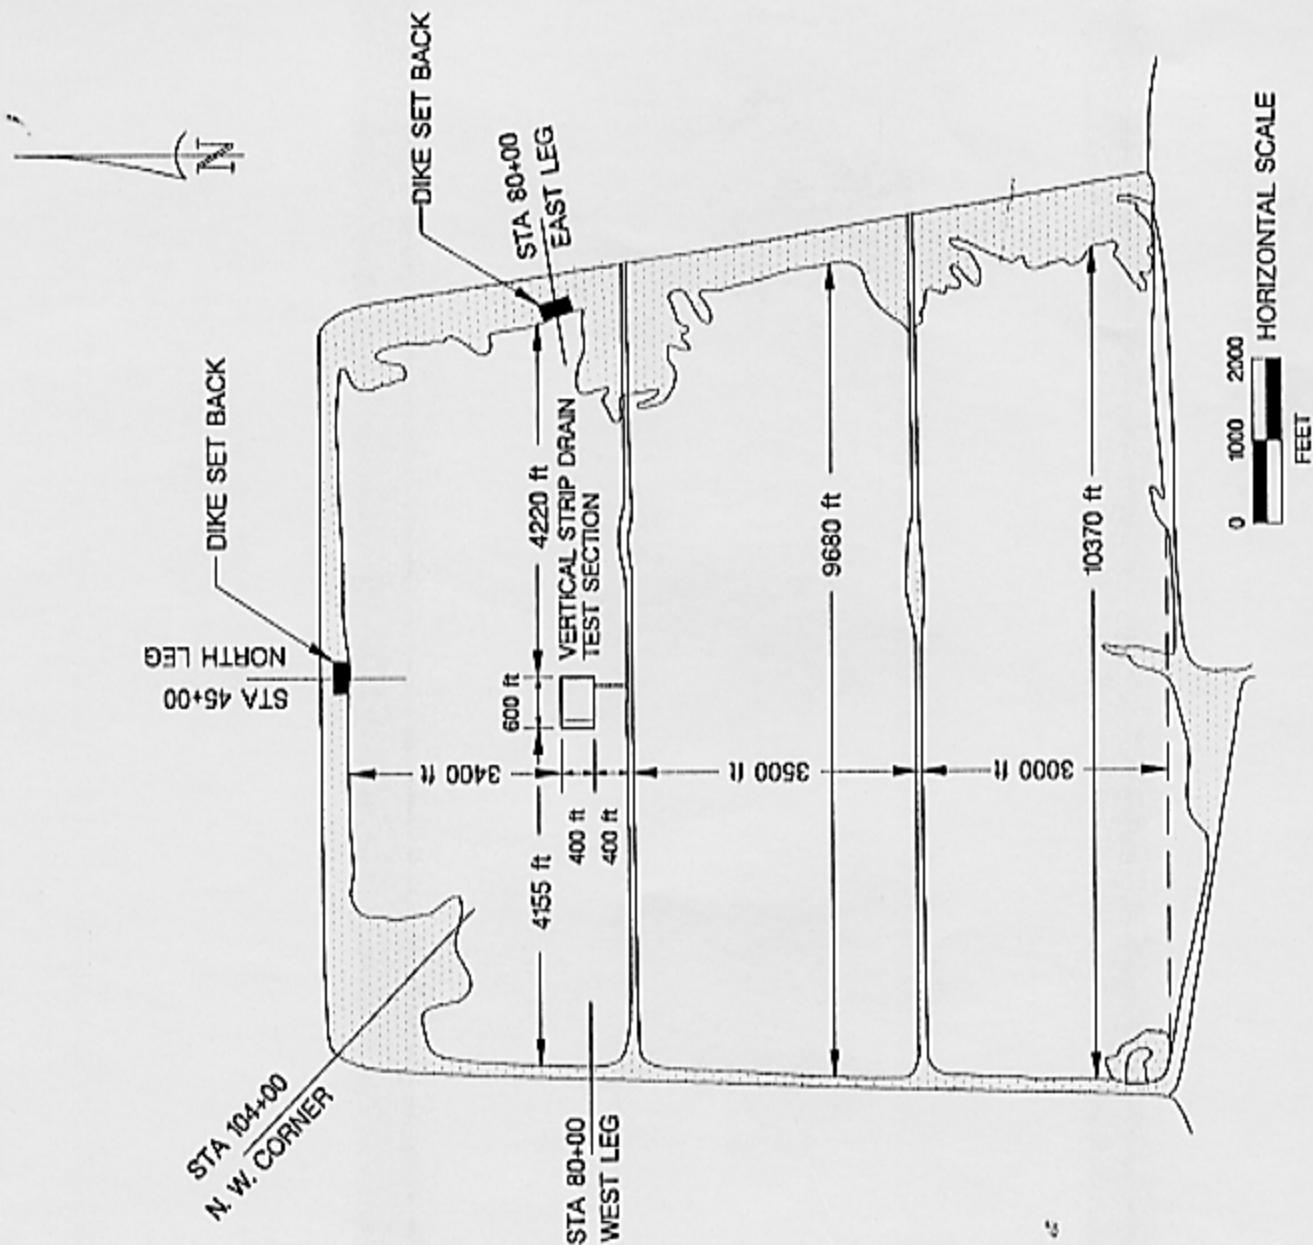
Plan View of Craney Island and Location of Vertical Strip Drain Test Section
